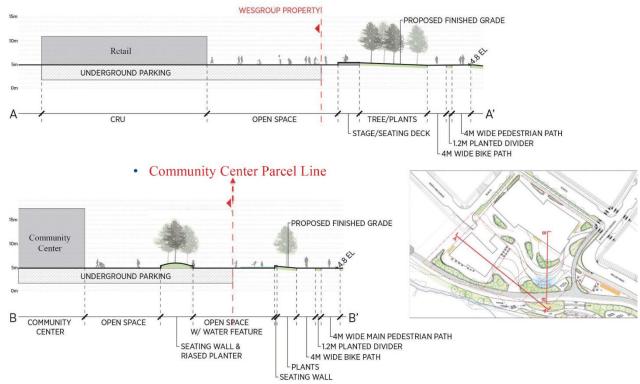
Parkade and Buildings Footprints in relation to the Plaza
